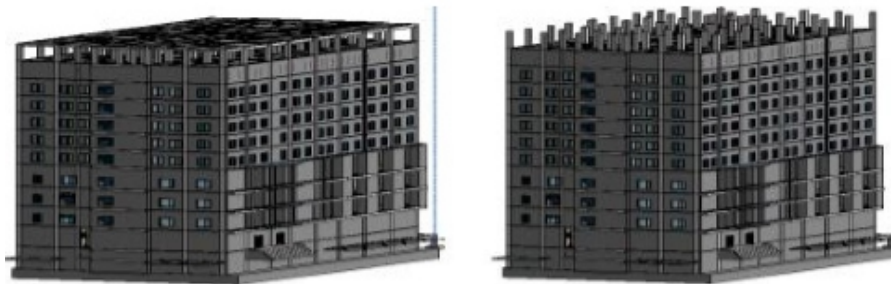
11th floor level beam Figure 38: 12th top FL and slab, 9th FL wall and floor and column and 11th floor level stair and 8th FL D & W for phase 27 shear wall, 10th floor level wall and floor and stair and 9th FL doors and windows for phase 28
